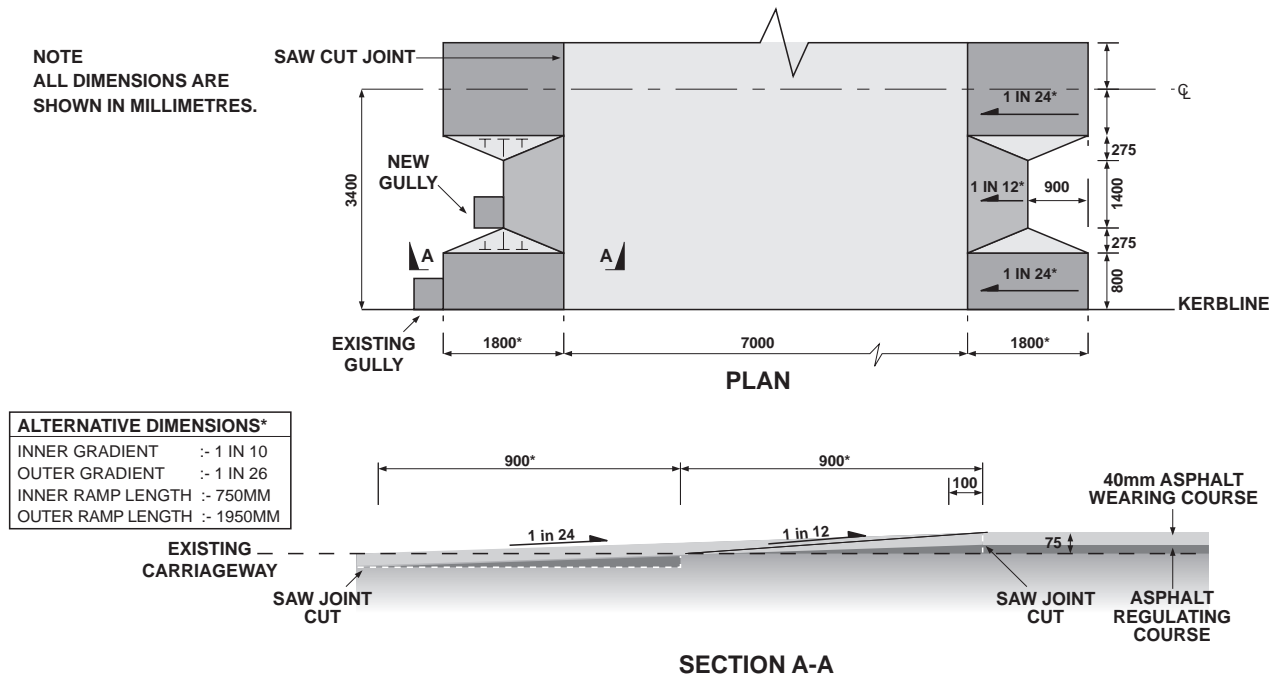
Plan view and cross-section of an 'H' road hump
